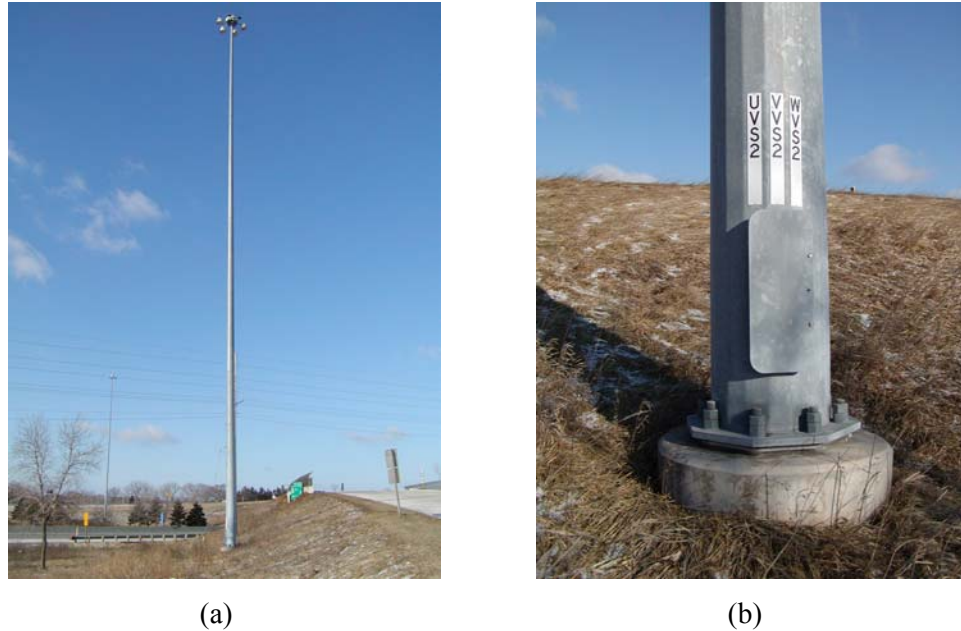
Luminaire Support Structure HML-67-006: (a) Full-Height View of Structure; (b) Detailed View of Base Plate and Anchor Rod Arrangement.
